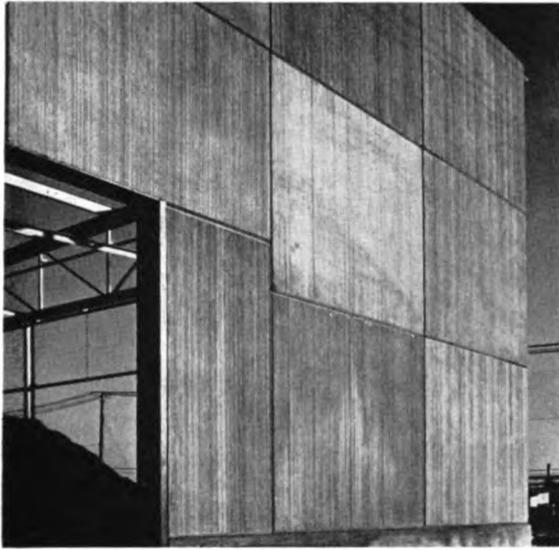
Wall has an insulating core of expanded polystyrene.
